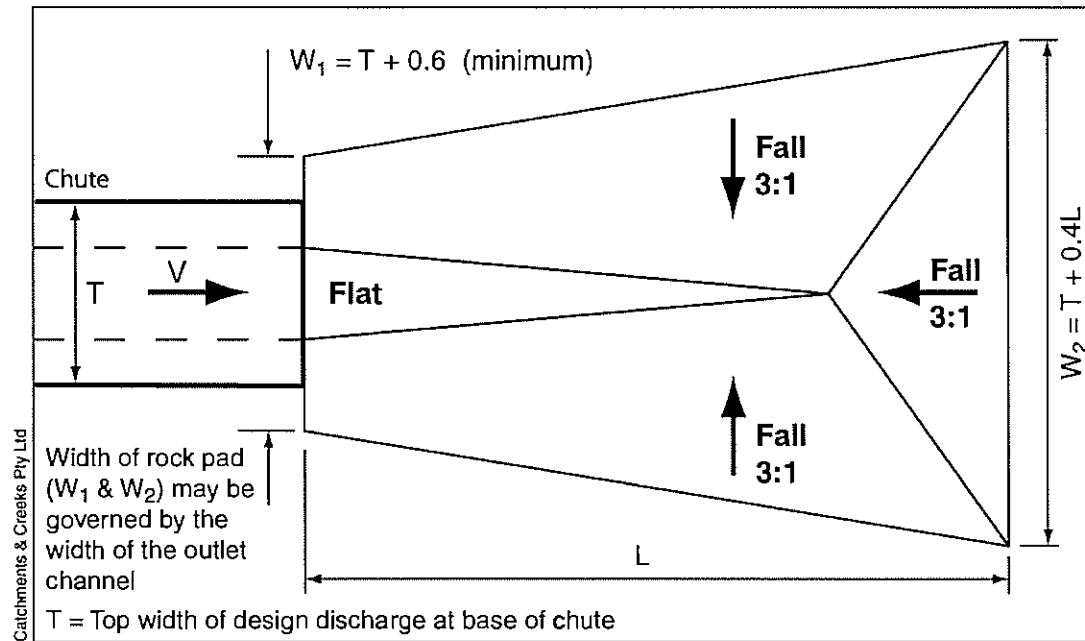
Typical arrangement of recessed outlet structure for minor *Chutes
